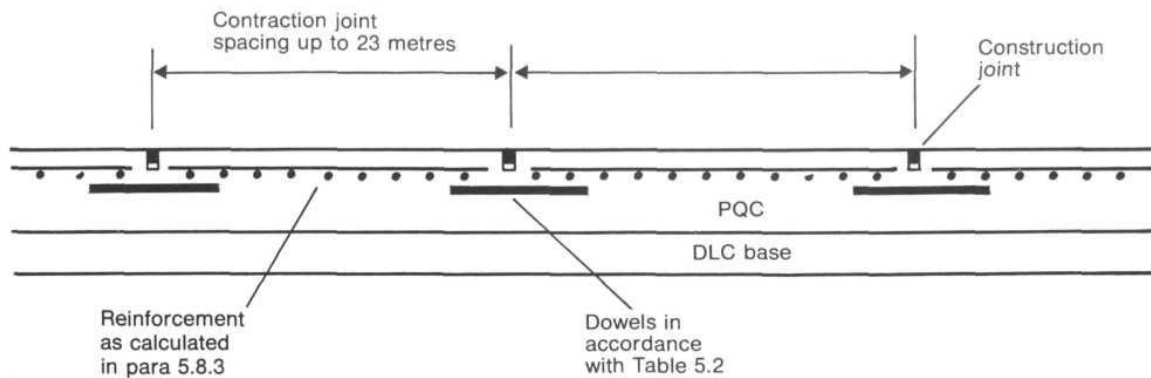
Typical longitudinal section through jointed reinforced concrete pavement
